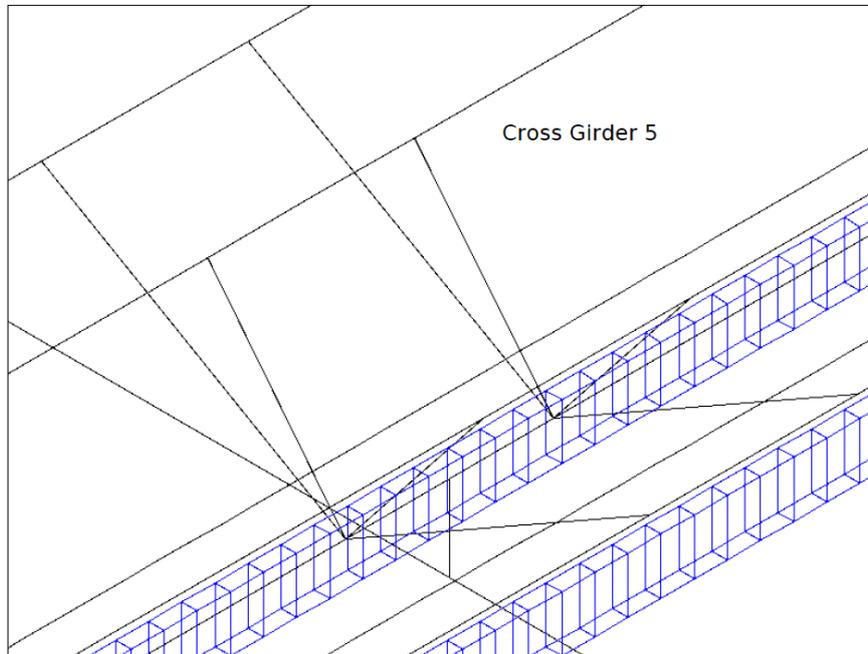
Isometric view of the railway girder across cross girder 5.
